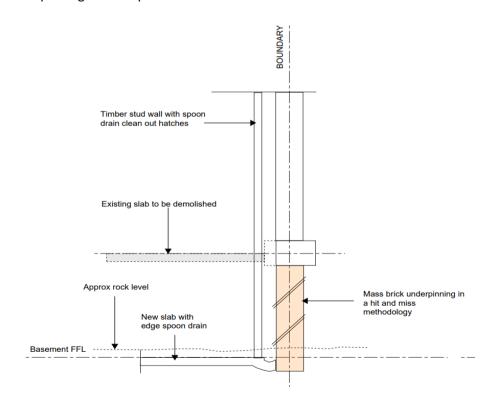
Section S-06 Cross Section Basement Stairs/Party Wall
